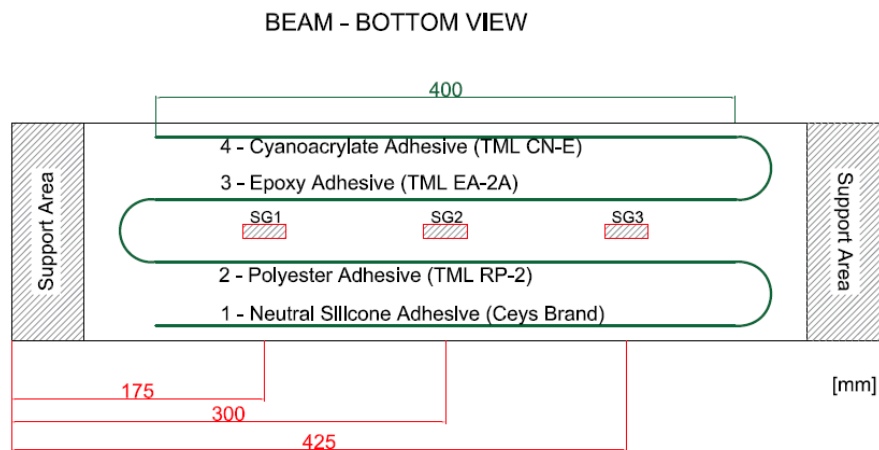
Plan of the reinforced concrete beam instrumented sensors
